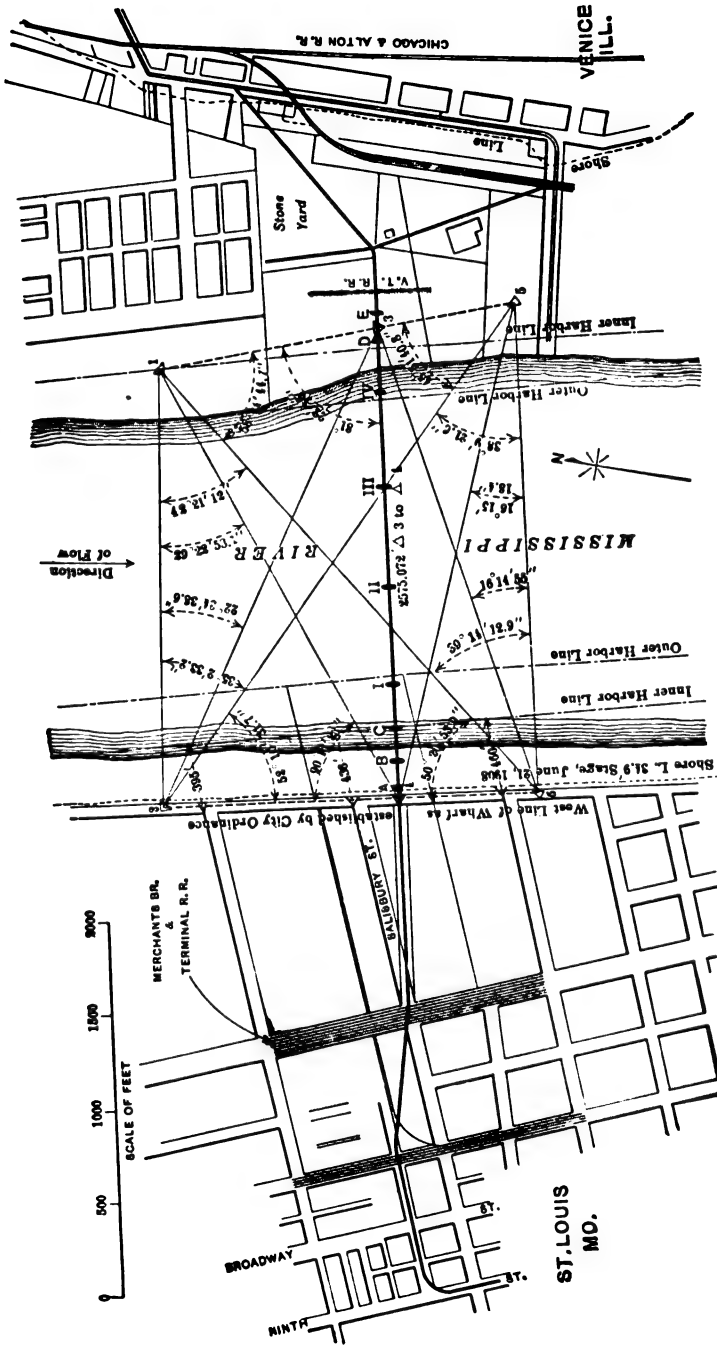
TRIANGULATION FOR LOCATING PIERS OF MCKINLEY BRIDGE.
